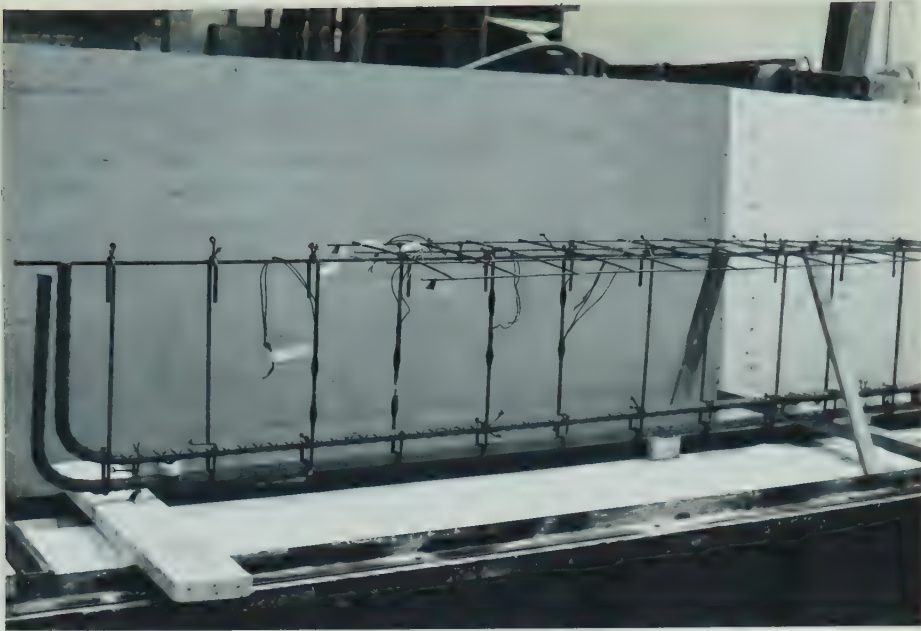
Reinforcement cage for TB 9 with strain gauges installed
